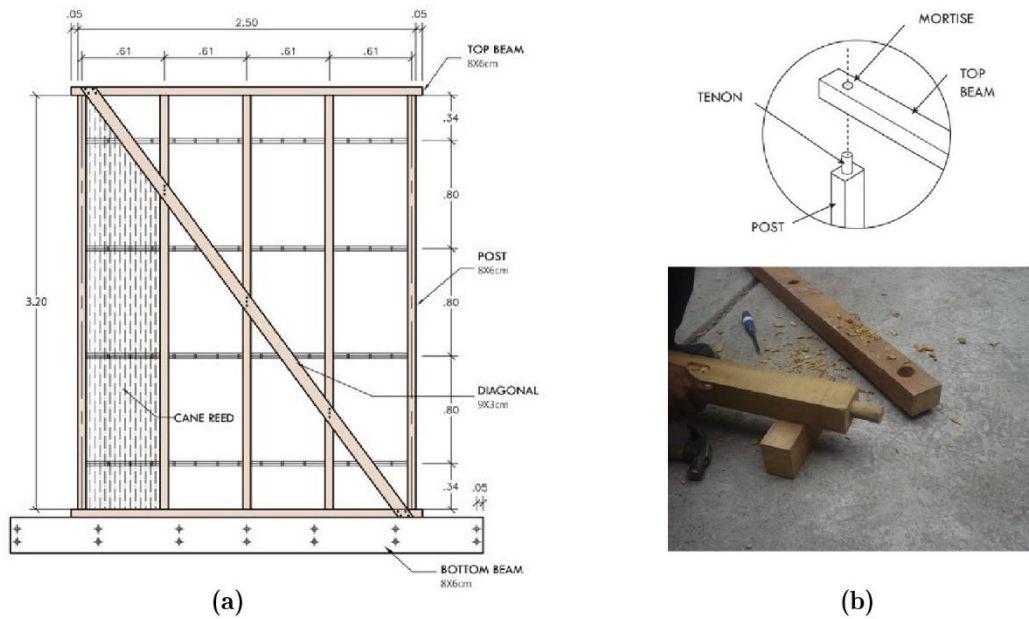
Full-scale *quincha* wall specimen: (a) geometry and (b) mortise-and-tenon connection (Torrealva, Vicente, and Michiels 2018)
